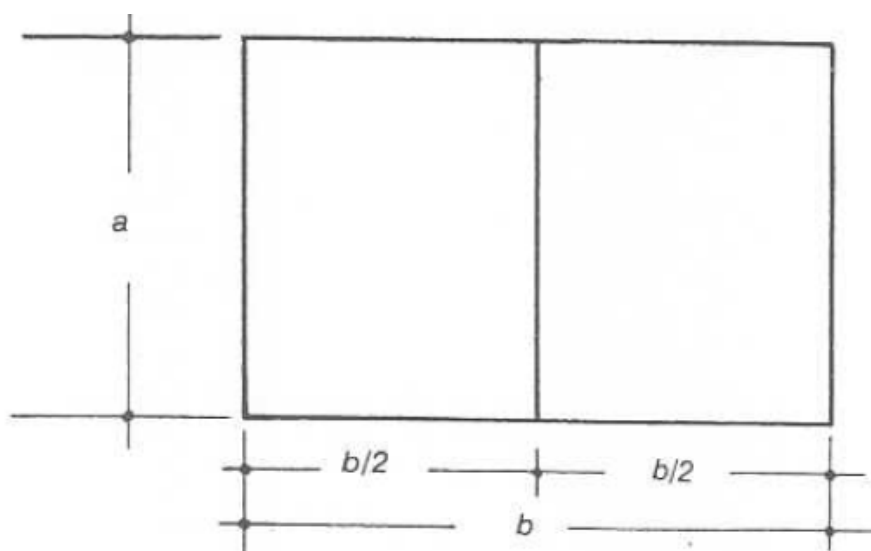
General geometric plan features of the double-containment tanks considered for the study
